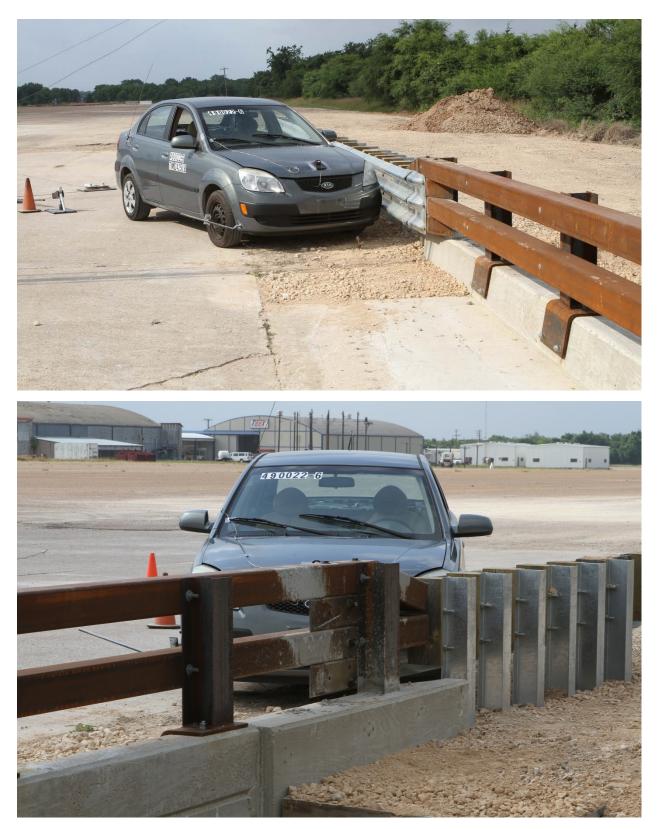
Vehicle/TxDOT T131RC Bridge Rail Transition Geometrics for Test No. 490022-6.
